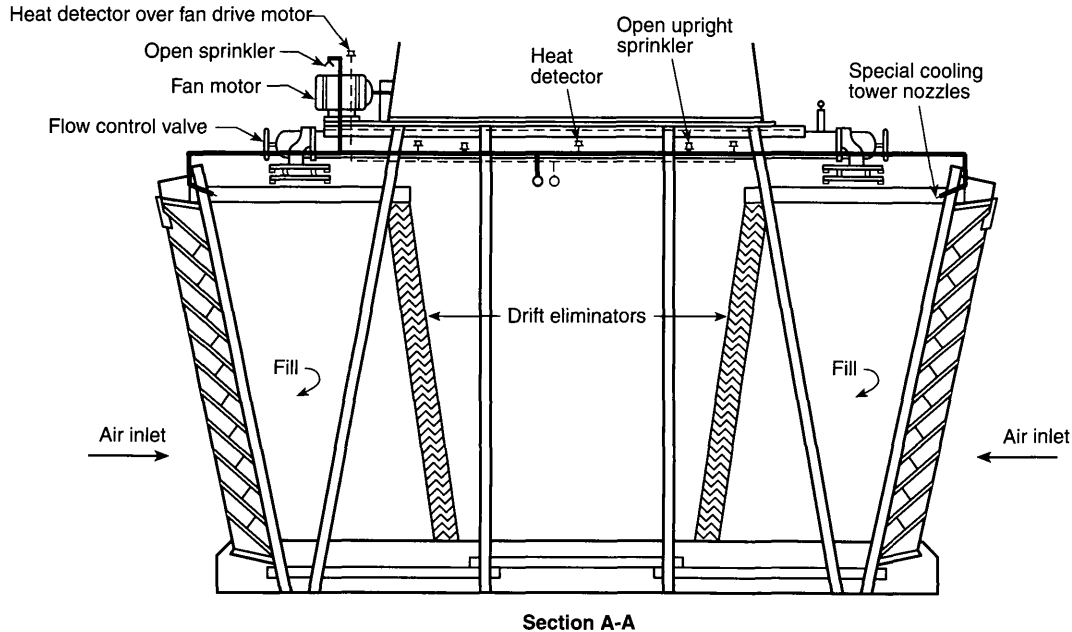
(b) Typical Deluge Fire Protection Arrangement for Crossflow Towers, Illustration 2. [214: Figure A.3.2.4.2(b)]
